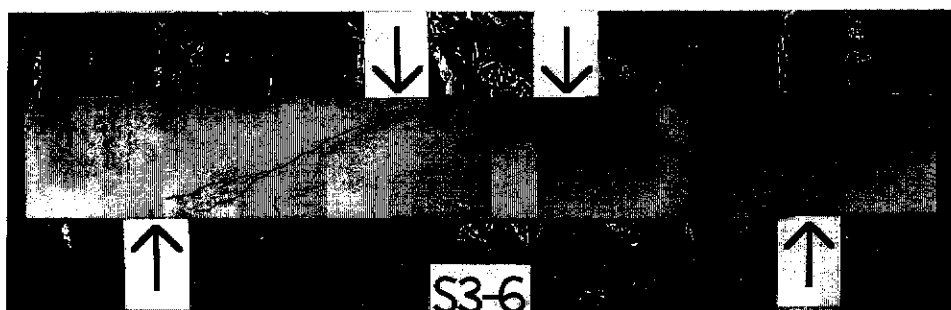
Crack Pattern of the Back Face of Beam S3-6
